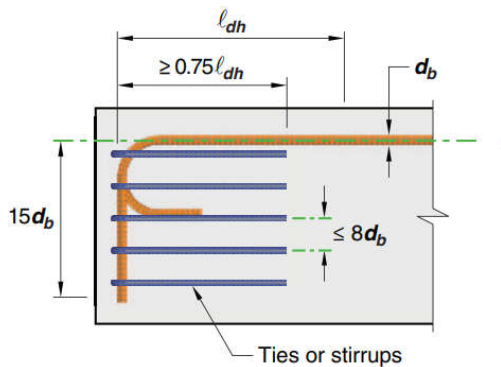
Confining reinforcement placed parallel to the bar being developed that contributes to anchorage strength of both 90- and 180-degree hooked bars.
